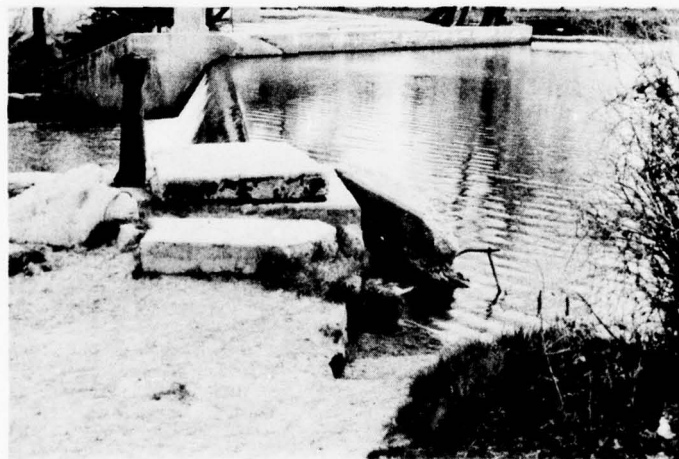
View of the left abutment showing the deteriorated and missing upstream end of the spillway wingwall, and the gate operating stand for the left low level outlet conduit gate; the sheet pile cut-off is exposed in the foreground
